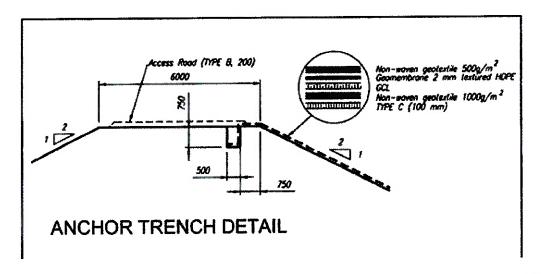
above shows the 2mm HDPE membrane detailed in the planning application for the stage 6 extension NA160408 Meath CoCo<sup>4</sup>
